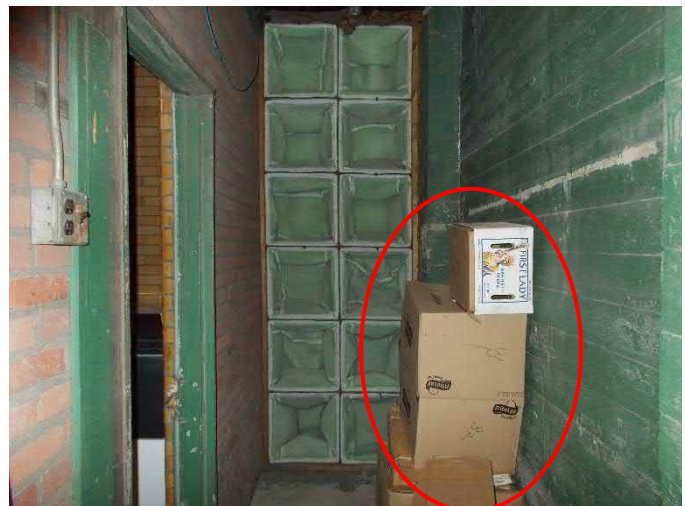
B – Ventilation air filters viewed from outdoor air plenum
